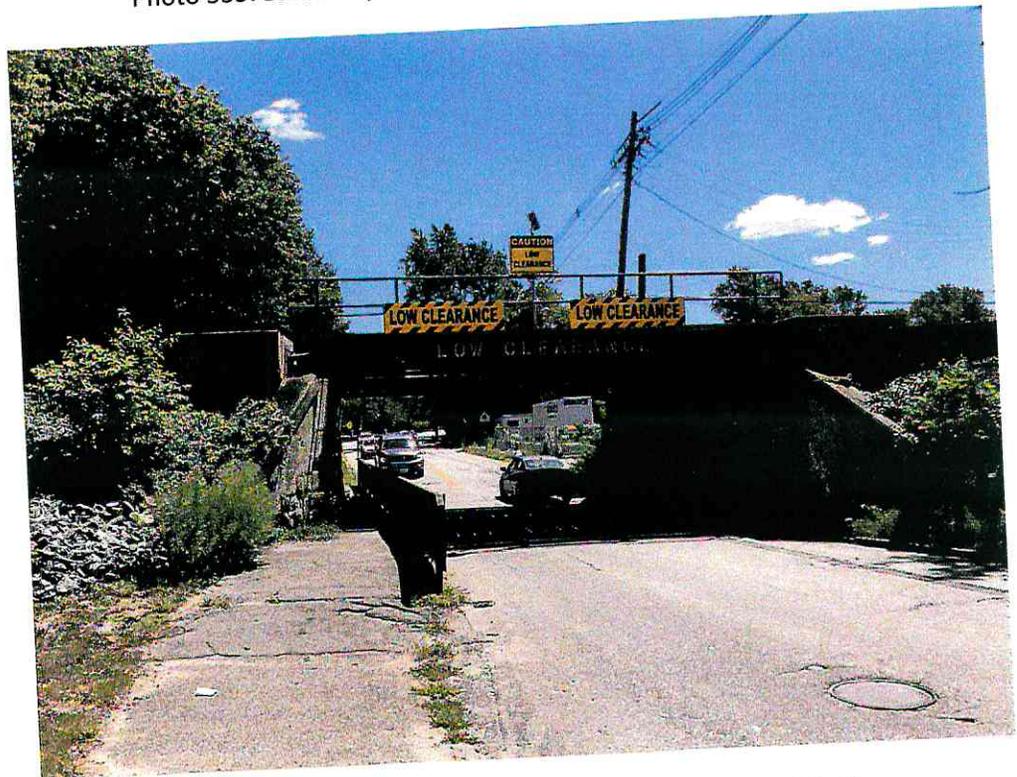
Location p – Cross St. looking east. Middle of Bridge.
